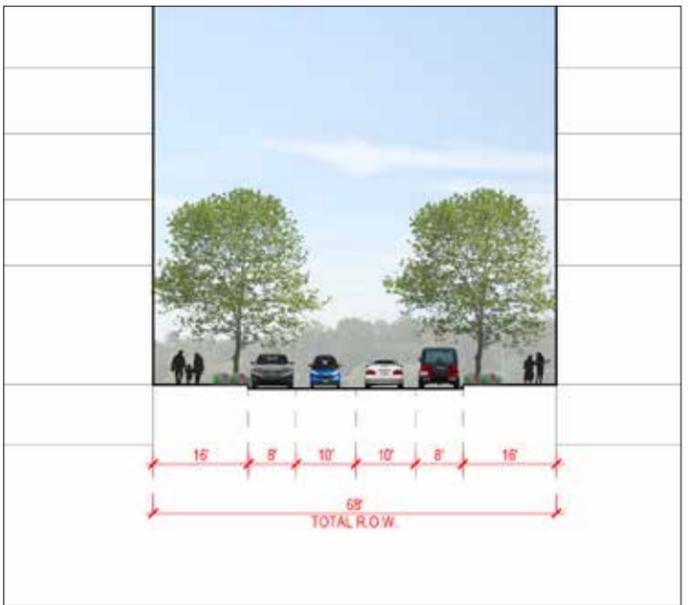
Cross section through typical "C" street without bike lanes or green connections
